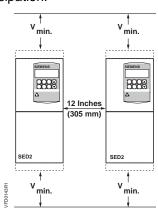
Mounting Dimensions of NEMA Type 1 SED2 in Inches (Millimeters).
